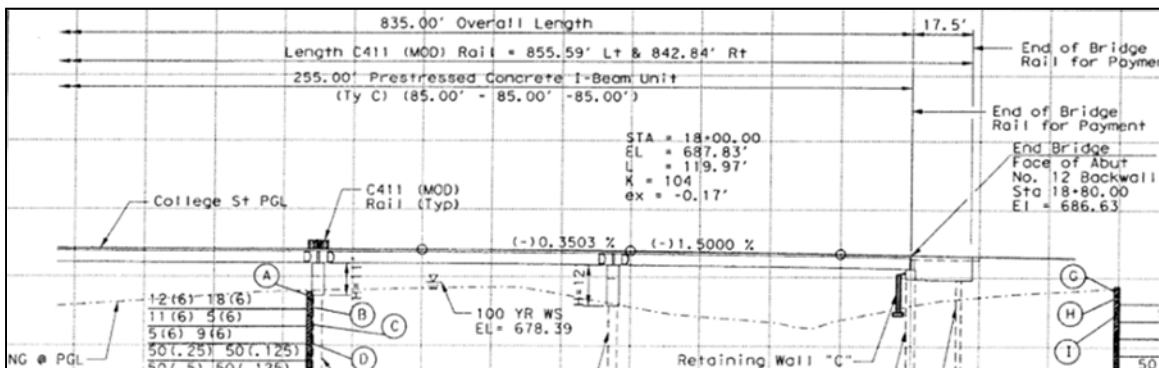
Elevation of Georgetown bridge deck for the winter pour.
